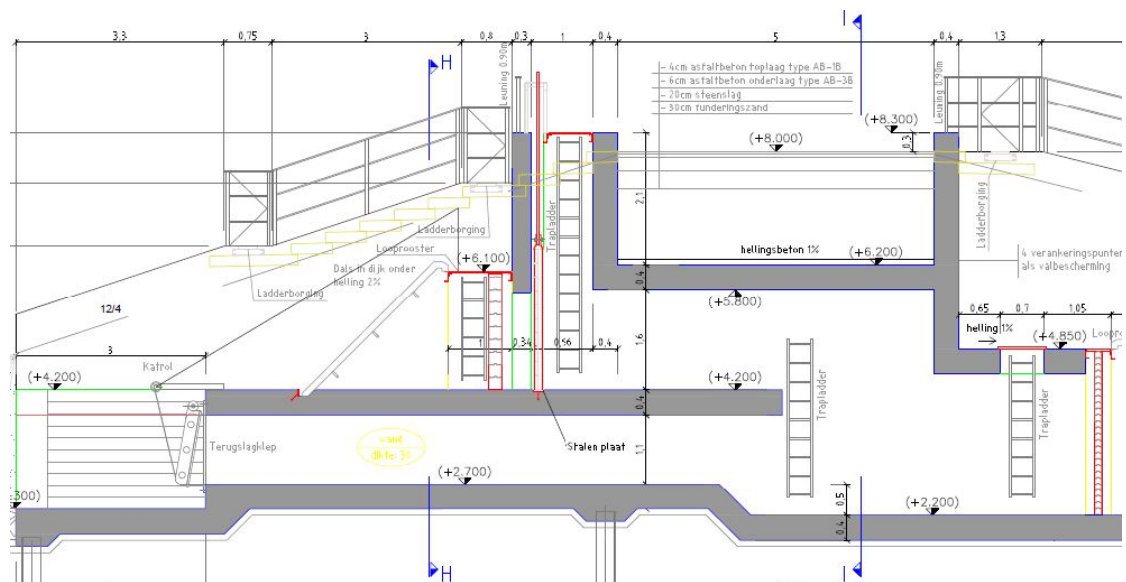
Detail of the side view of the construction of the new inlet and outlet culverts in Bergenmeersen.
